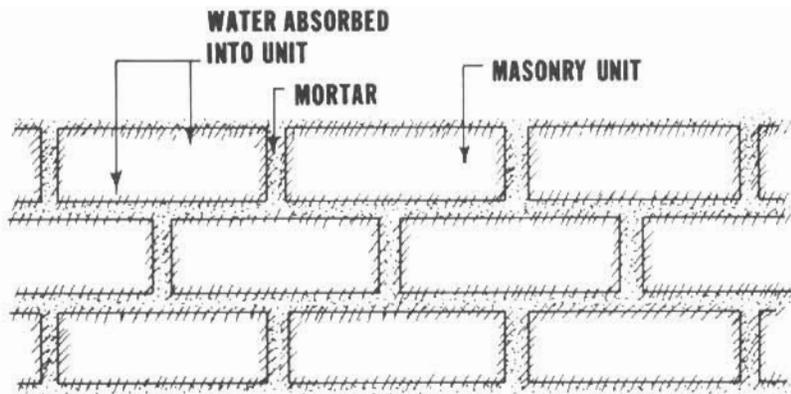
Masonry Units Absorbing Excess Water from Mortar.
